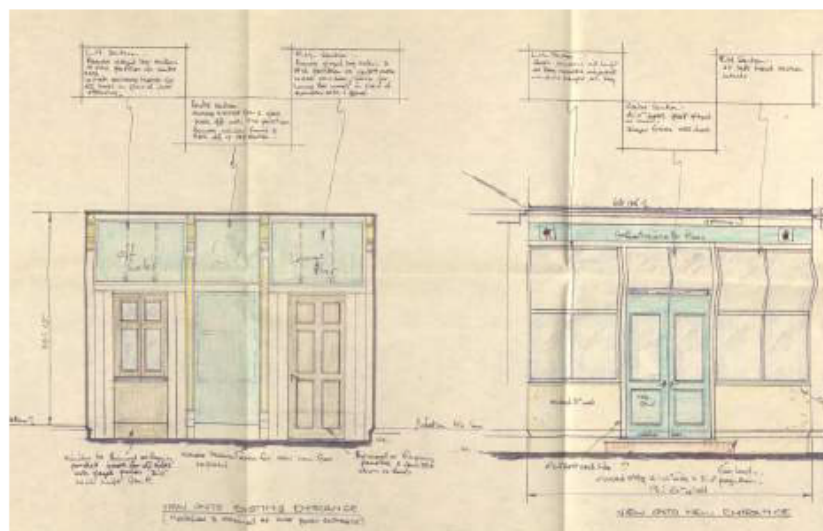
Elevation plan showing the proposed enclosing of the front entrance in 1977.
